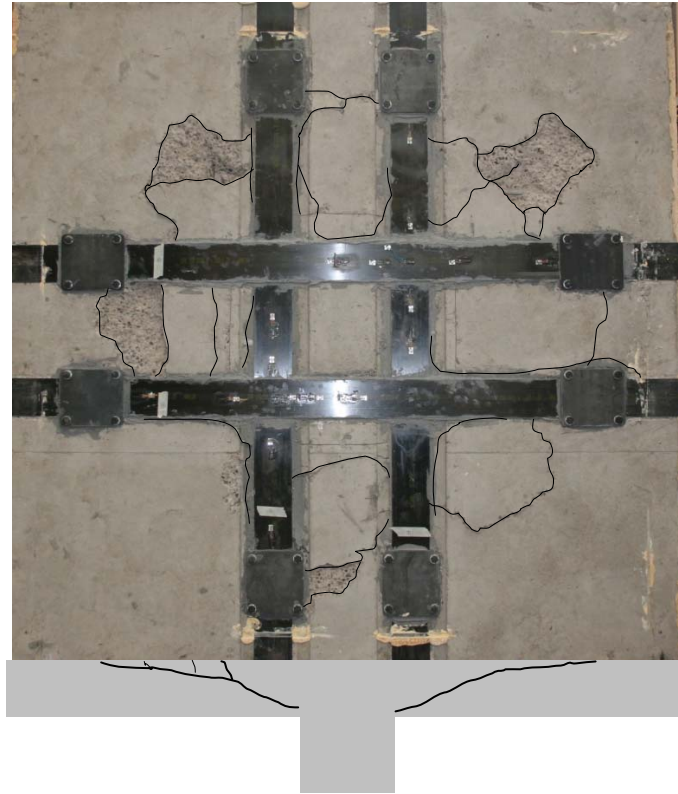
Crack pattern of slab RS-F<sub>15</sub> after failure.
